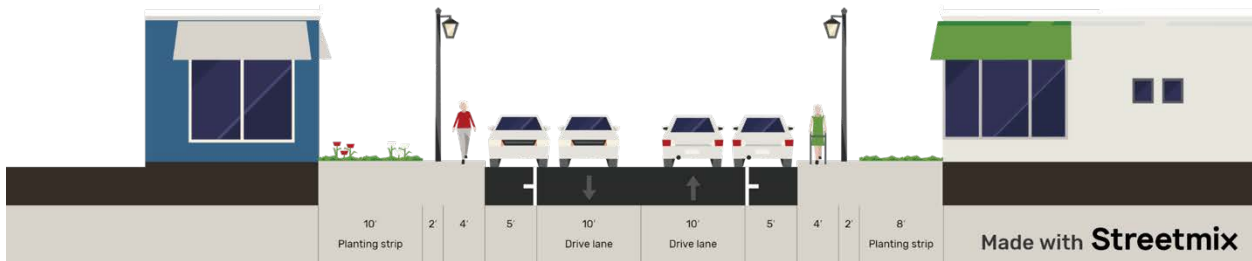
Proposed layout for Chambers Street, looking east from Carroll Street. The new design will include accessible sidewalks and pedestrian-scale lighting on both sides of the street. Diagram created in Streetmix by EC, 2022.
